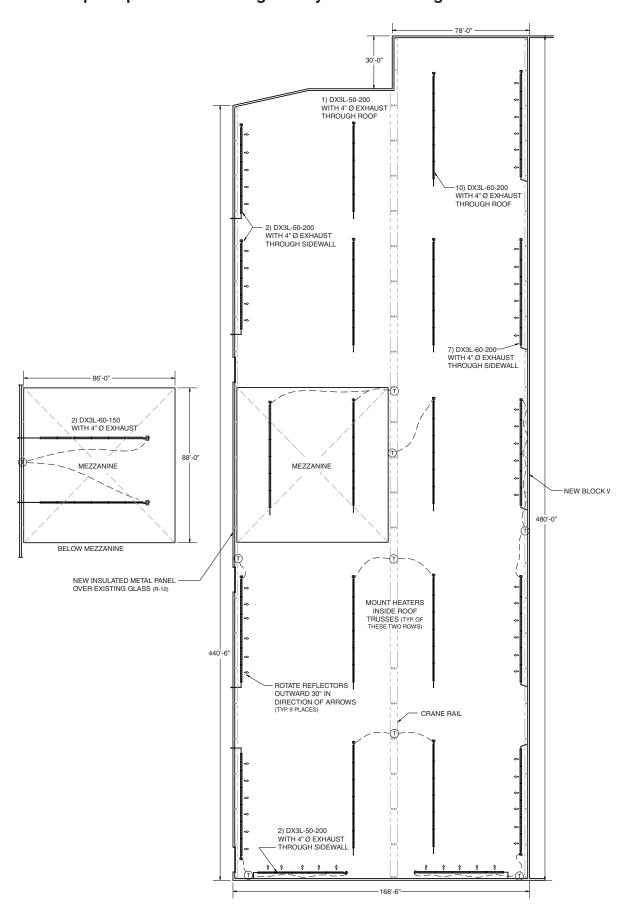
• Open Span Manufacturing Facility - Total Building Heat
